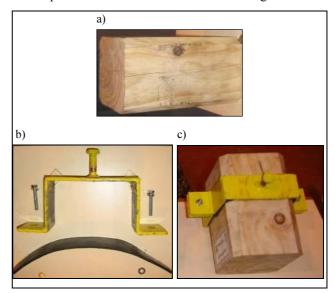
The specimen used for the tests: a) rectangular shaped wooden stock; b) type 3 collar; c) assembled specimen
